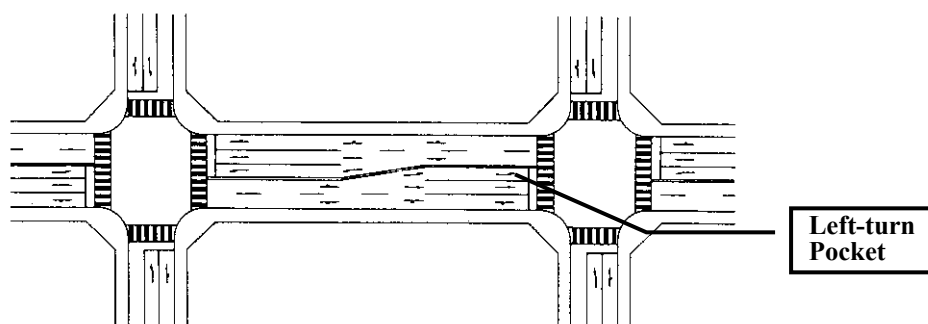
A Sample of the Widening Plan at Approach of Intersection
